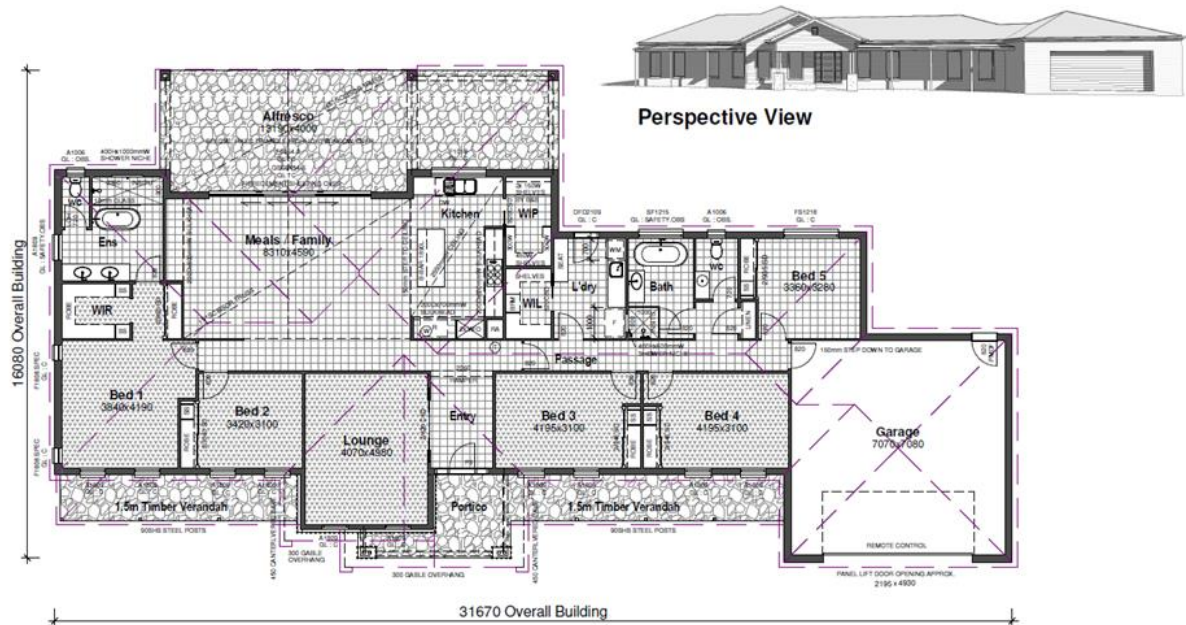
Proposed dwelling sketch plan (Source: Lewis Dickson Homes Pty. Ltd.)
